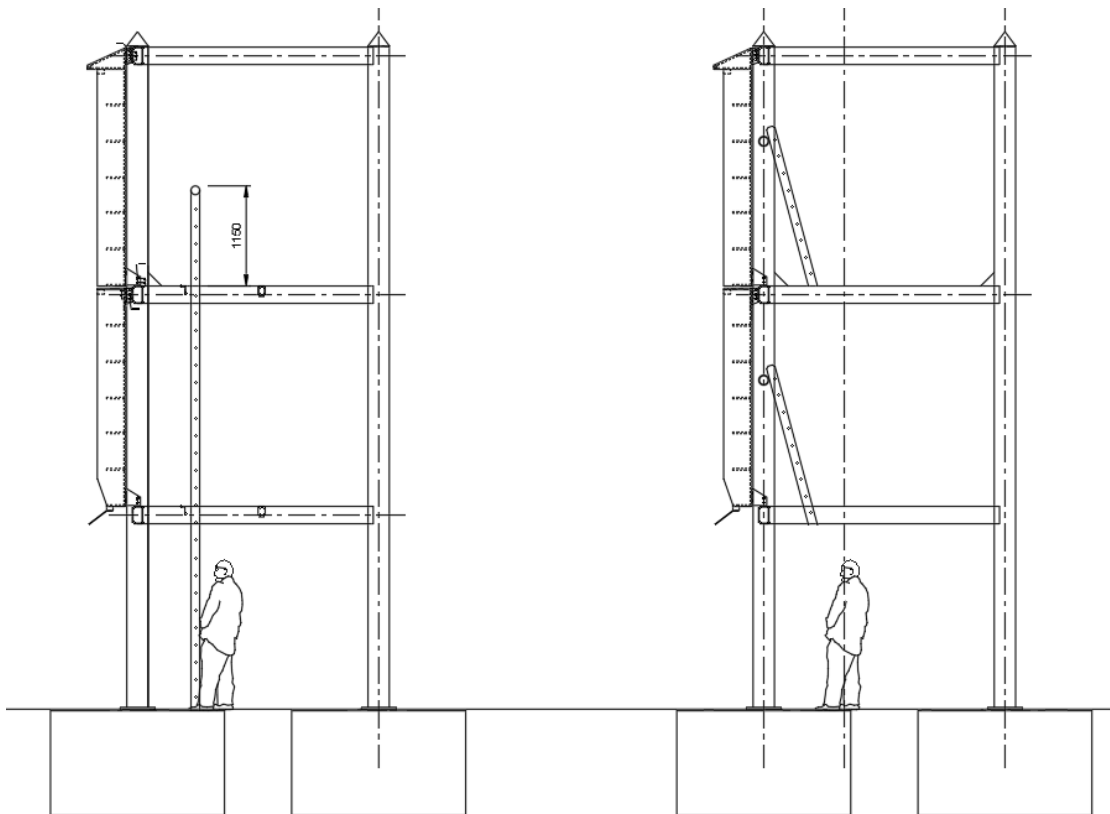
Tower Structure Side View with Mass Concrete Foundations and Internal Ladders
